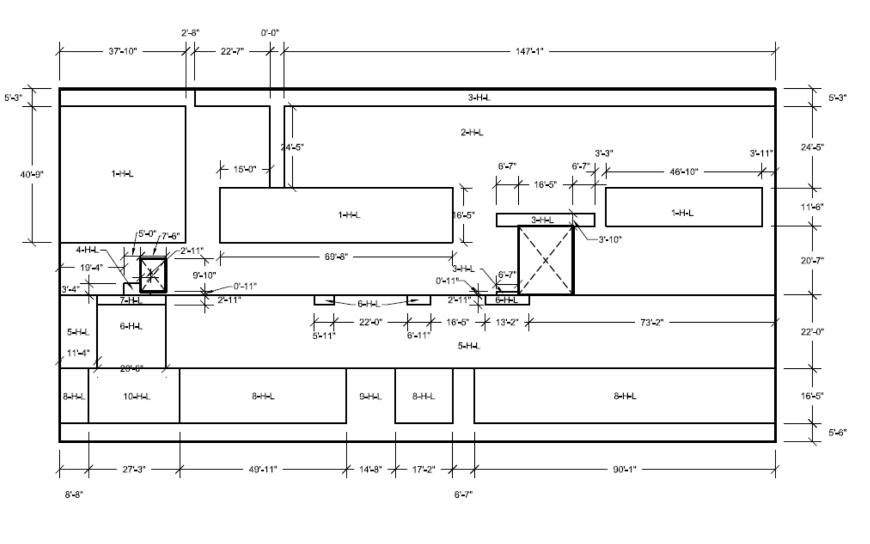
H.3-10 North Wall Looking South Horizontal Reinforcement Zones Far Side Face
